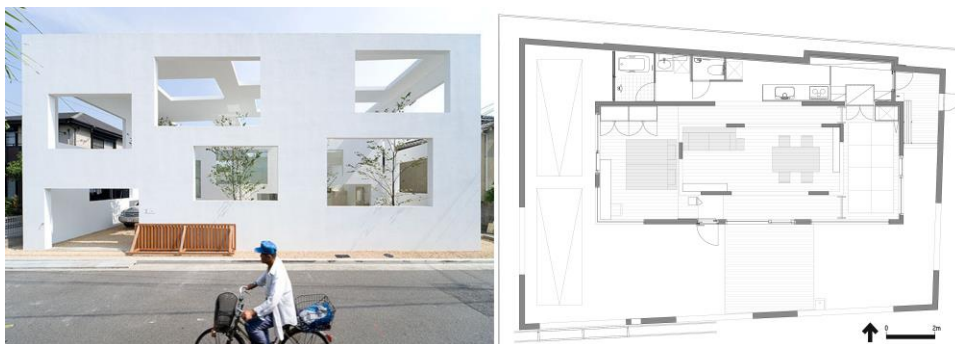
Outer cubic shell; main floor plan: minimalist-fluid space
